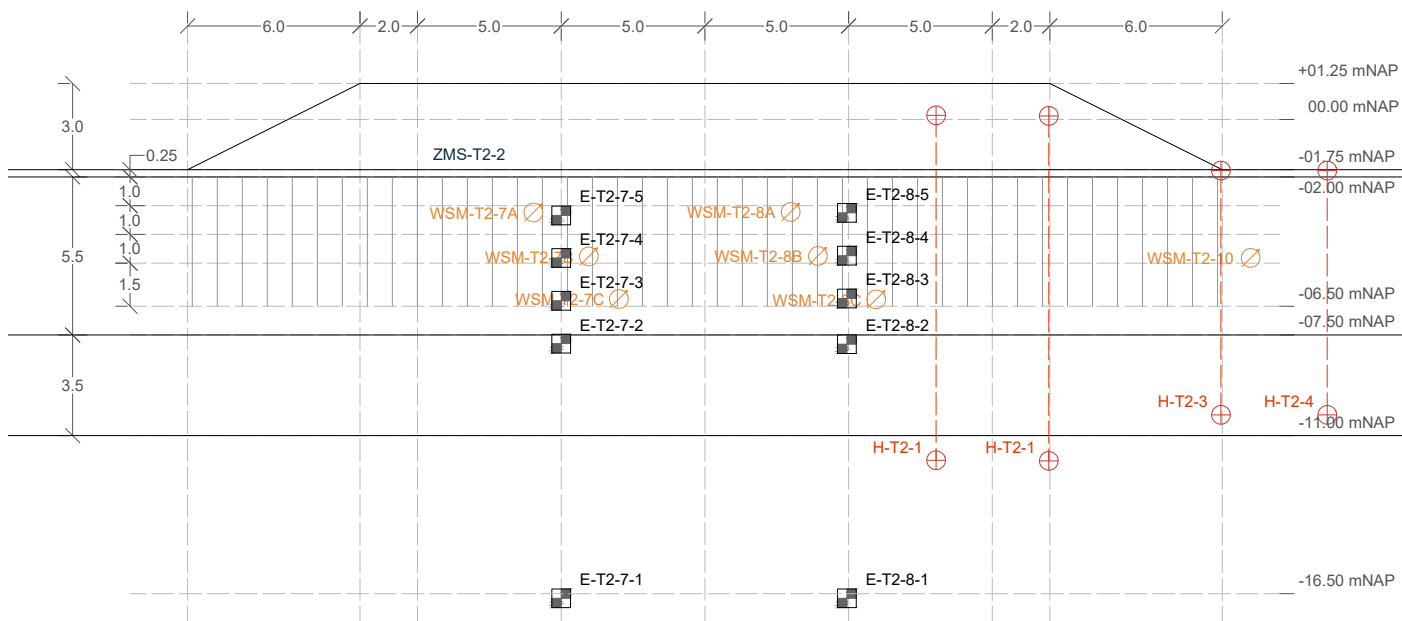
Layout of monitoring equipment at embankment no. 1
